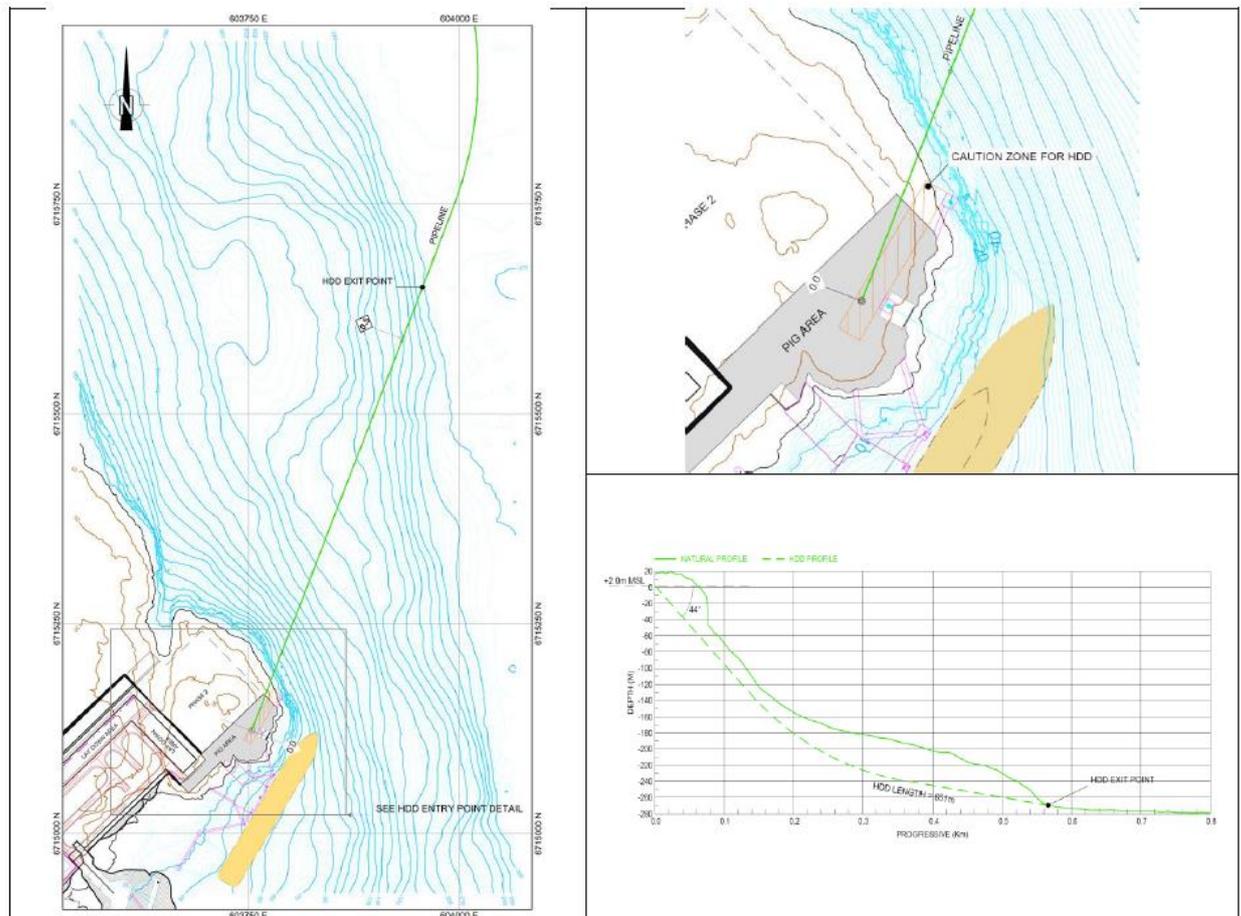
Schematic view of landfall solution (HDD tunnel)
